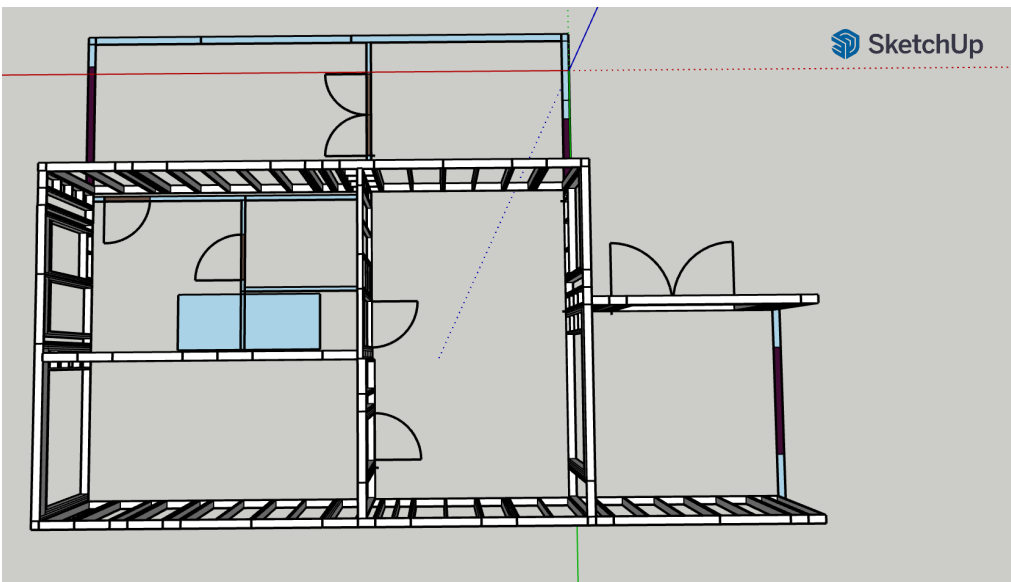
Ground floor layout in smaller version. Floor layout shows original size. “Left” wall is moved inwards and some internal walls removed. (IL3GF under the stairs and cathedral window of garden room not shown.)
